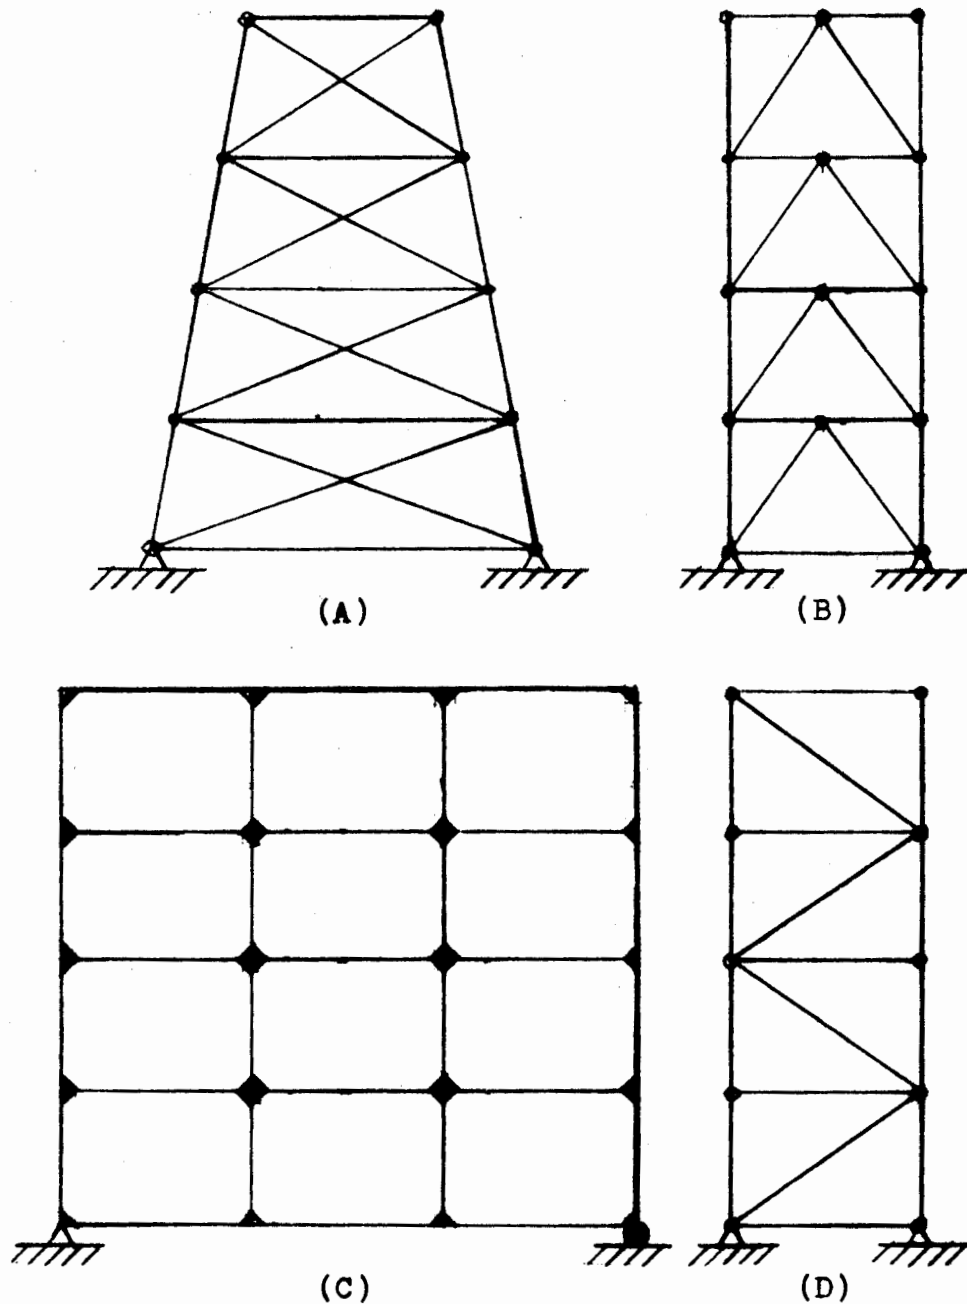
Types of trusses and frames used for the support of wind power equipment and solar concentration units. (A) "X" bracing. (B) "K" bracing. (C) Vierendeel truss. (D) Warren truss.
